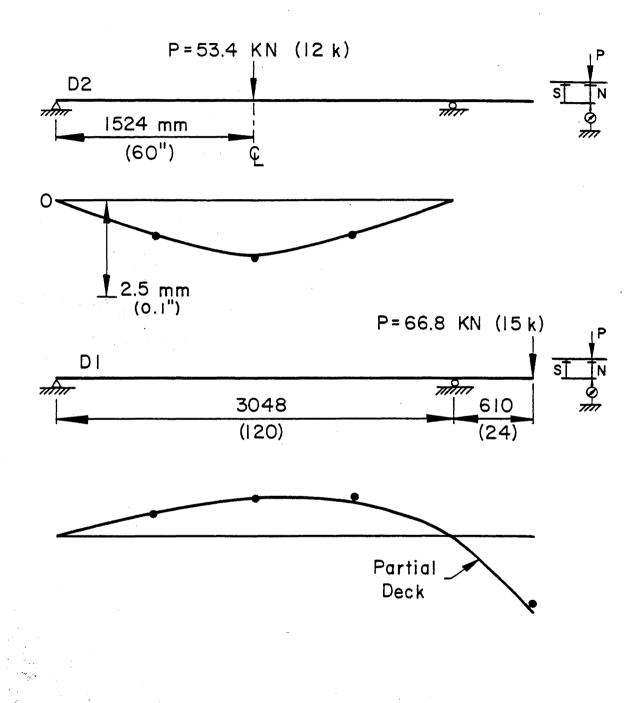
Deflections along the Span of Box Girders D1 and D2
